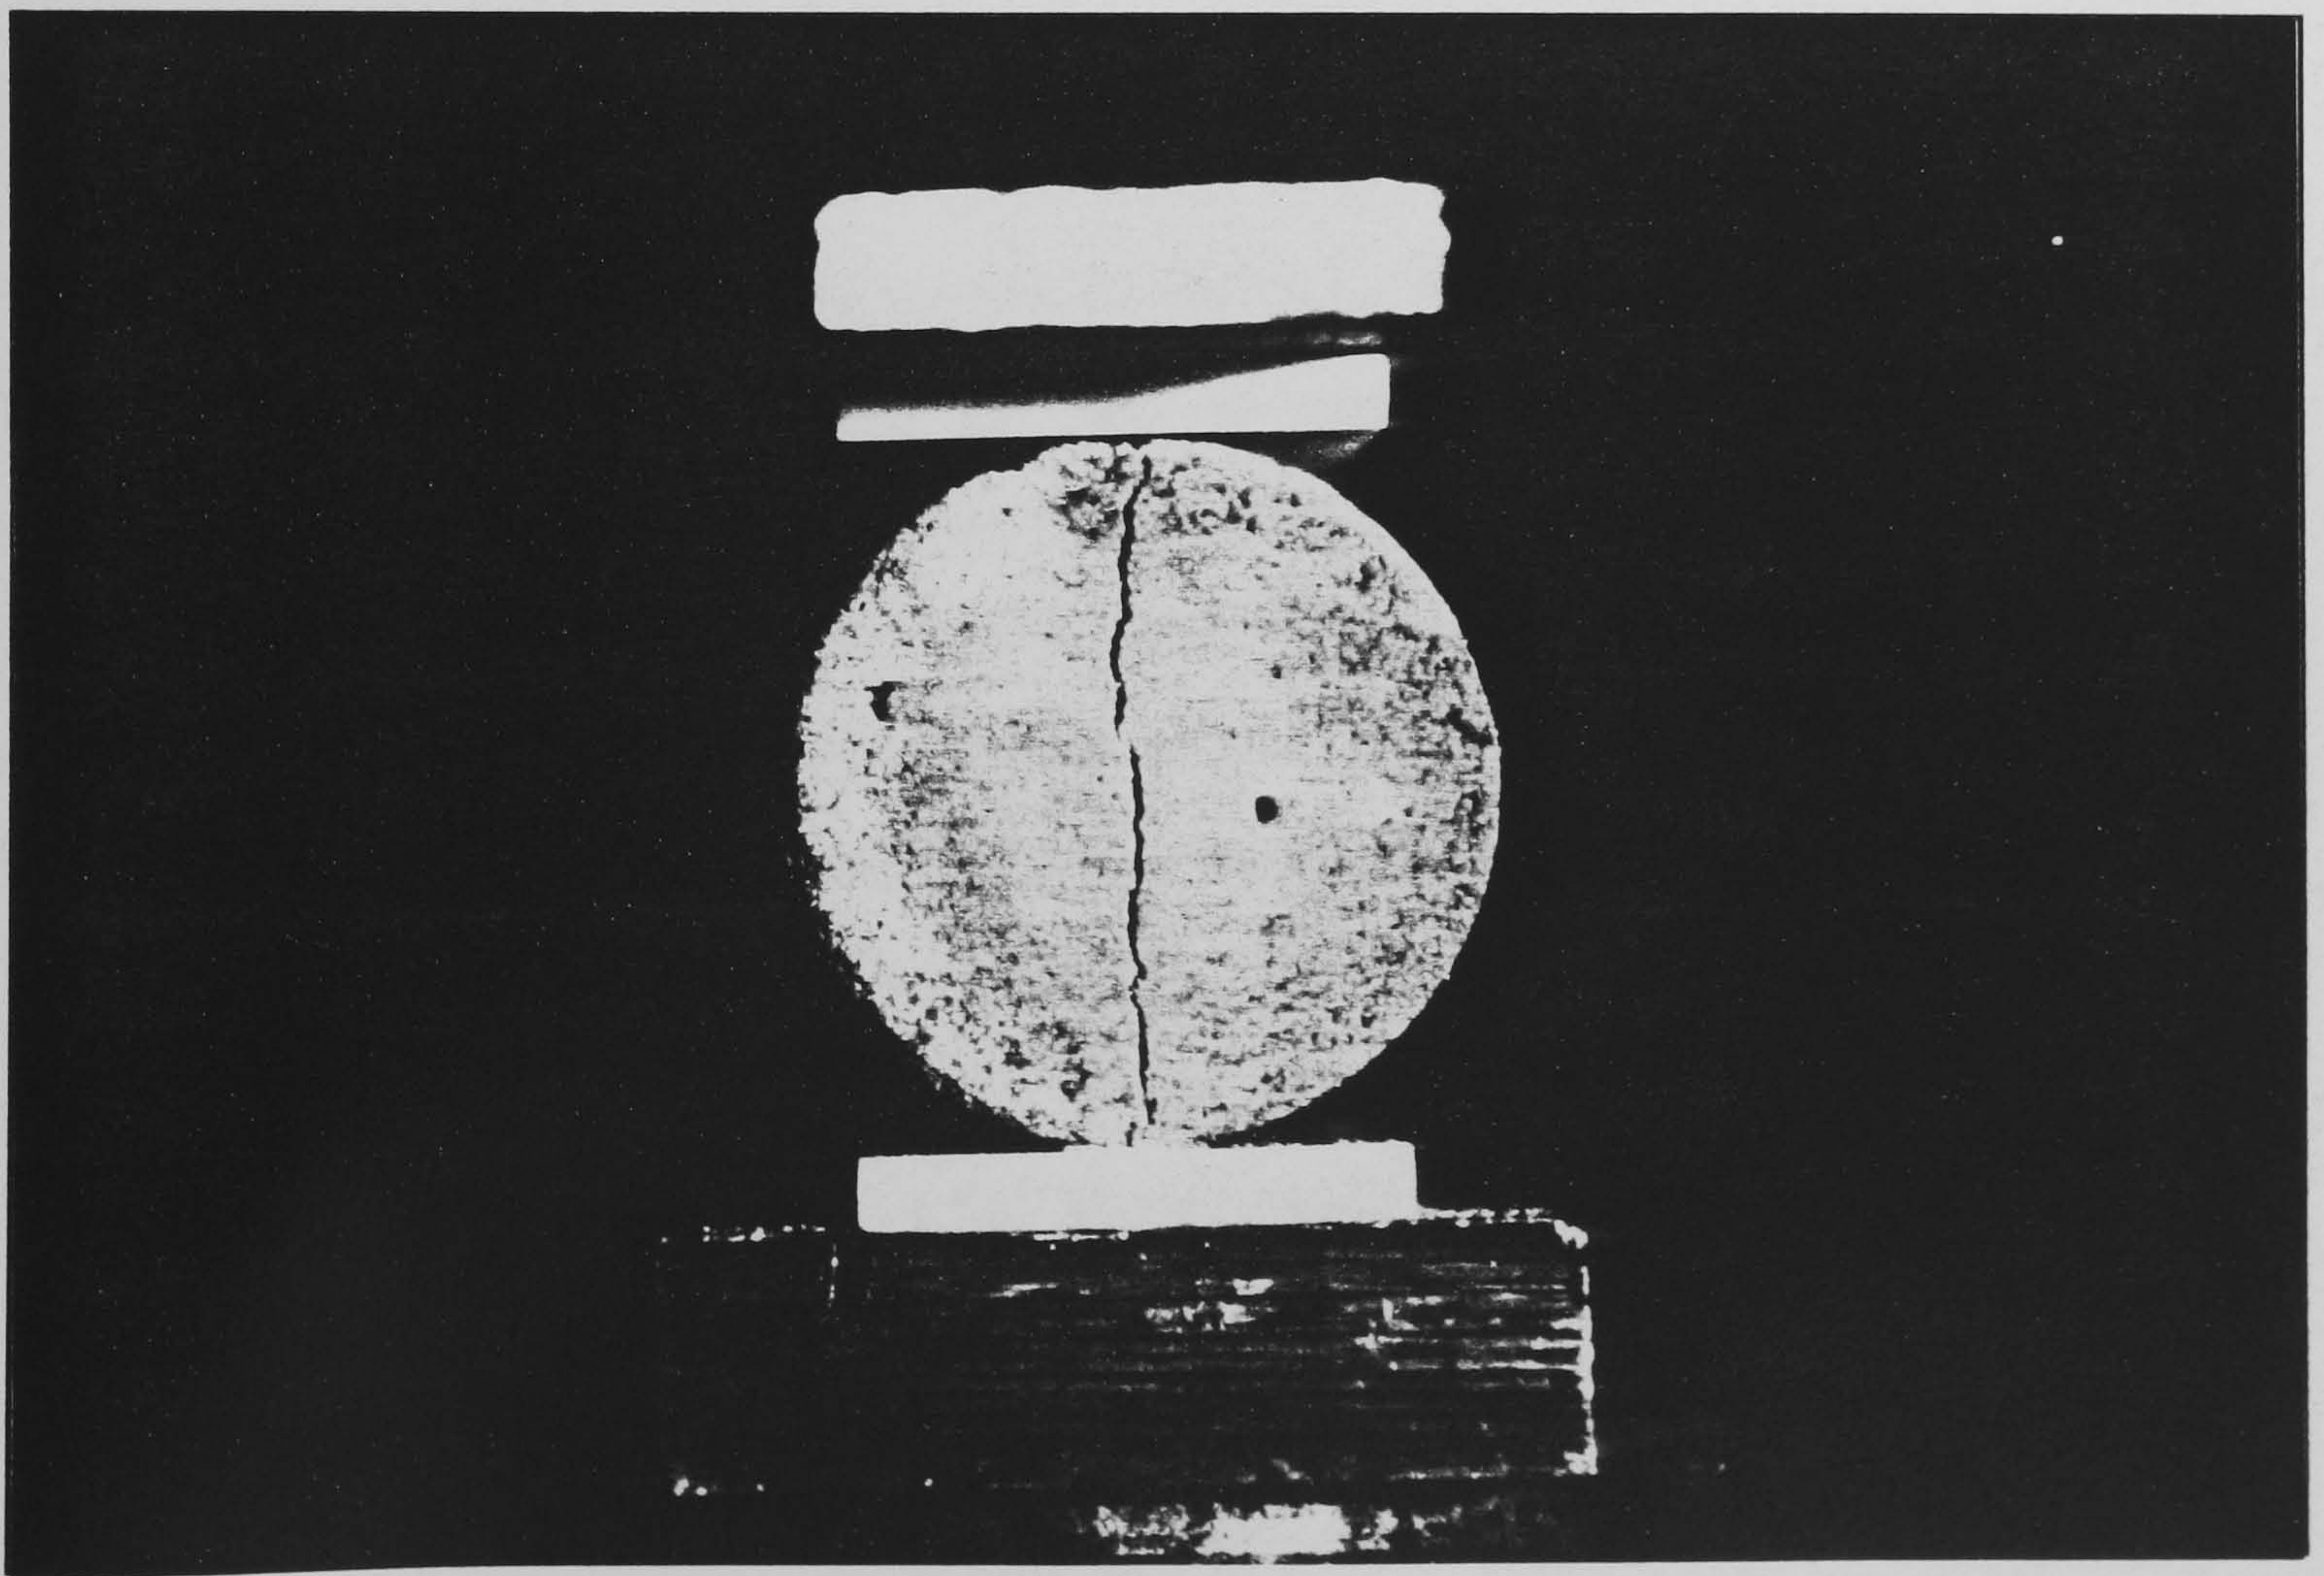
Brick-mix cast cylinder and tensile splitting failure mode
